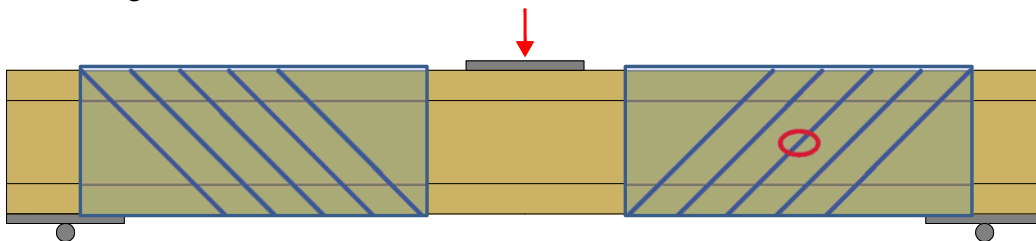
Timber member with shear reinforcement; shaded areas: reinforced areas with screws arranged under 45°
